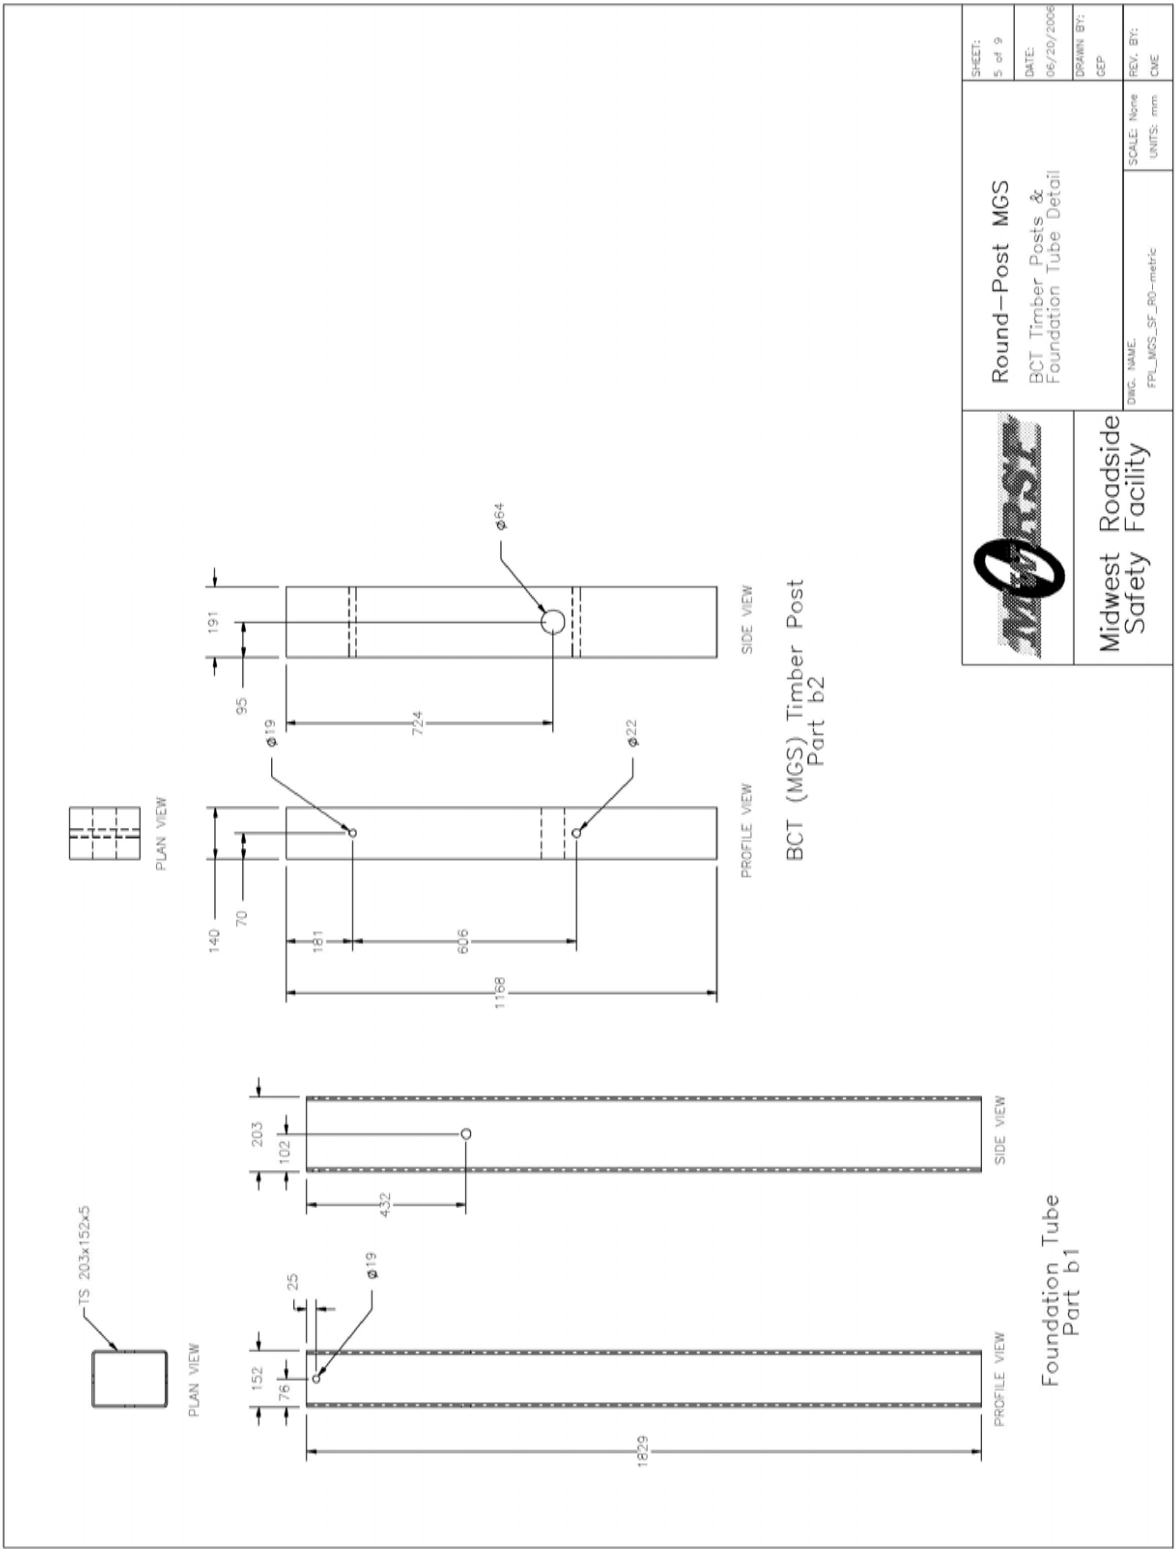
MGS Round Post Southern Yellow Pine Details – Anchor Post Detail
